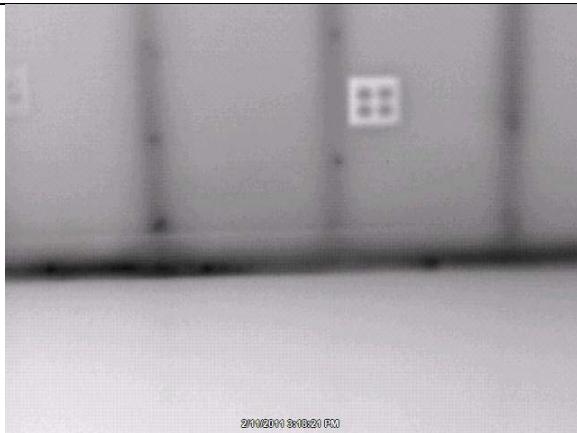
An image to show a section of typical wall at the bottom of the building. The infrared image shows no air leakage at studs – the studs are cooler because they bridge the cavity insulation. Without the exterior foam insulation the effect is much worse. Notice that every gyp board screw can be seen because it runs a little cooler than the surrounding gypsum board. At the bottom of the wall the dark line is mostly the result of the steel C-track acting as a thermal bridge. There may be some minor air leaks that pose no problems.
